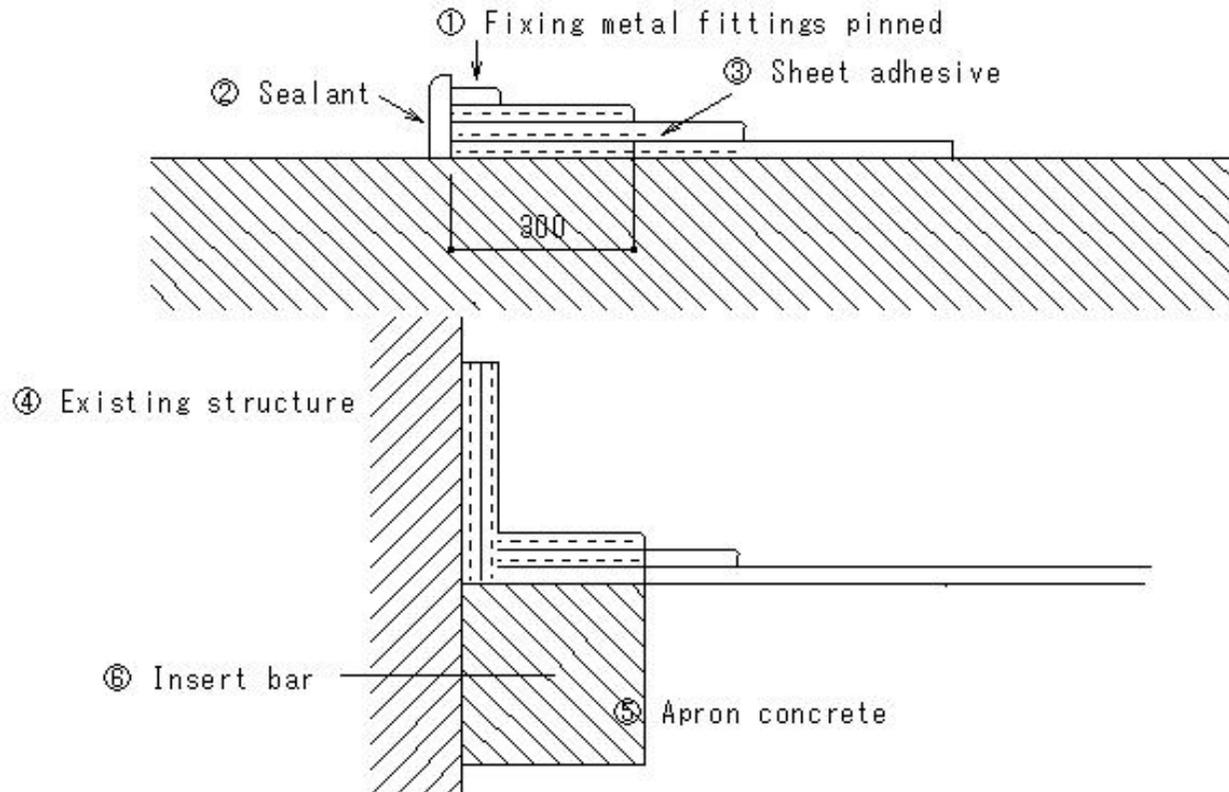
Application for adhesive bonding to concrete structures (independent structures) (synthetic rubber sheet)
